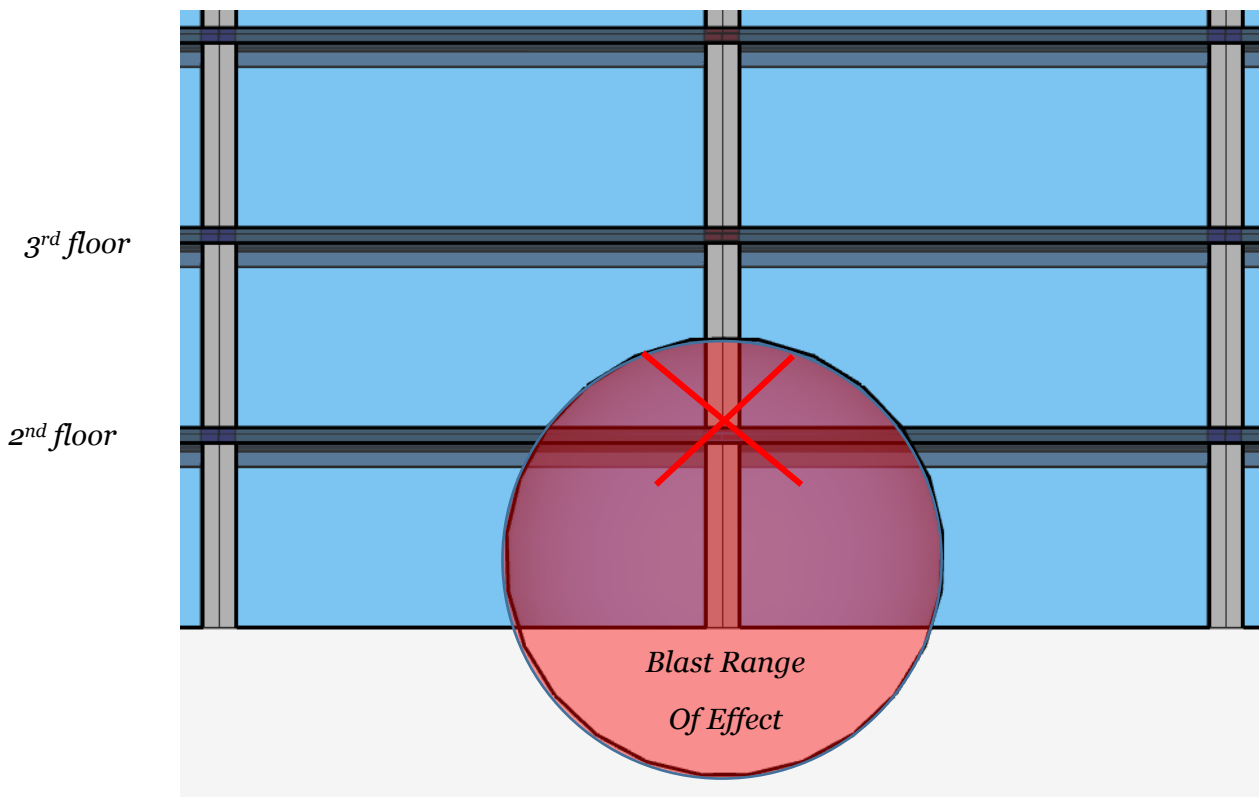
Image showing the blast range of an internal explosion and effect on column to slab joint.
